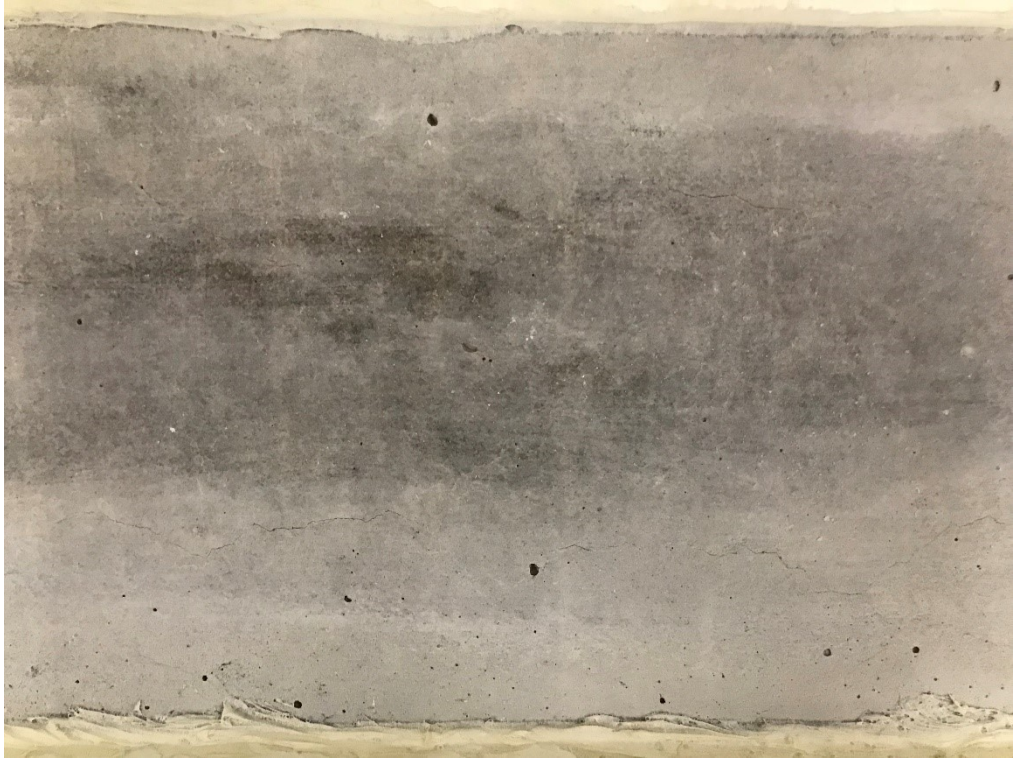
35 Longitudinal cracking on R3 beam surface
